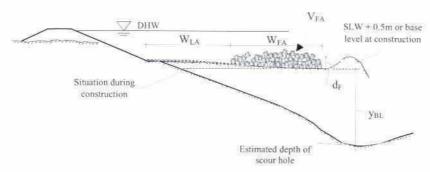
Geometric properties of a typical falling apron for standardized revetments (schematic)
